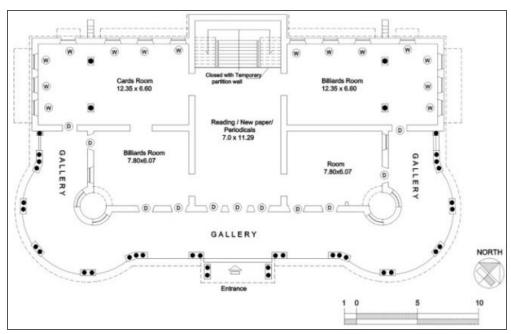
Victoria Jubilee Town Hall Ground floor plan Source: Author
